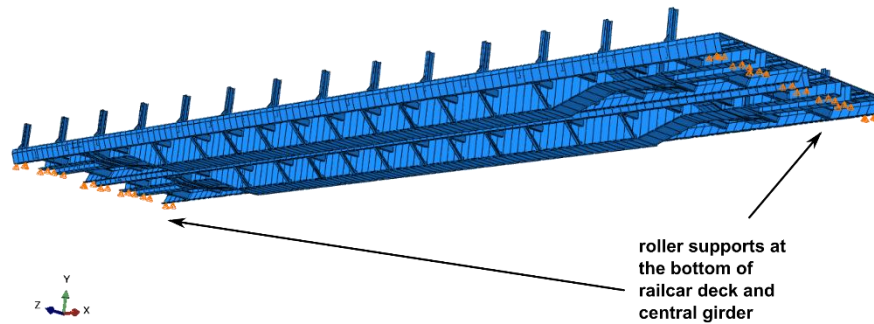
Boundary conditions simulating bridge resting on retaining wall
